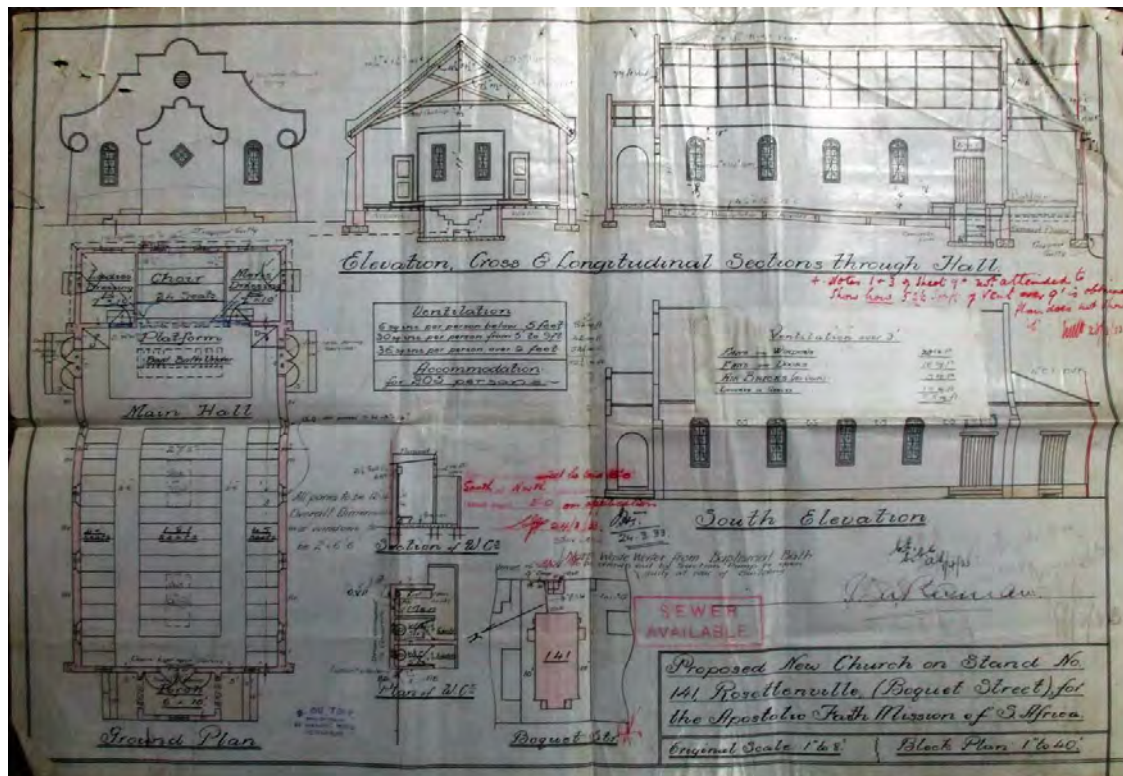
Proposed new Church on Stand 141 Rosettenville for the Apostolic Faith Mission of South Africa
